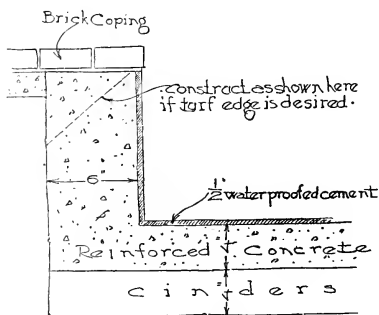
Section through side of a shallow pool to show details of concrete and foundation construction and arrangement of brick coping, if desired; also line to be followed if turf margin is wanted instead of coping
